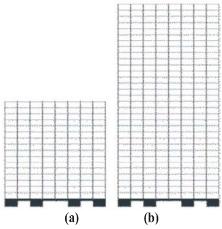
Reinforced concrete geometric models a. 16-storey frame work b. 32-storey frame work
